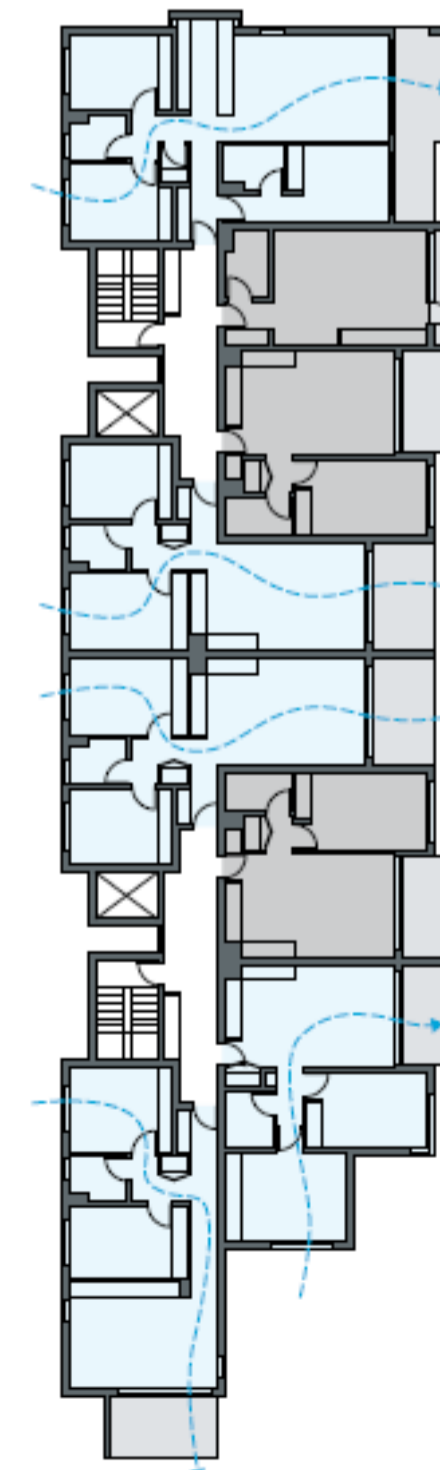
B.4 The floor plan above demonstrates one approach for how five of a total of eight apartments achieve natural cross ventilation
